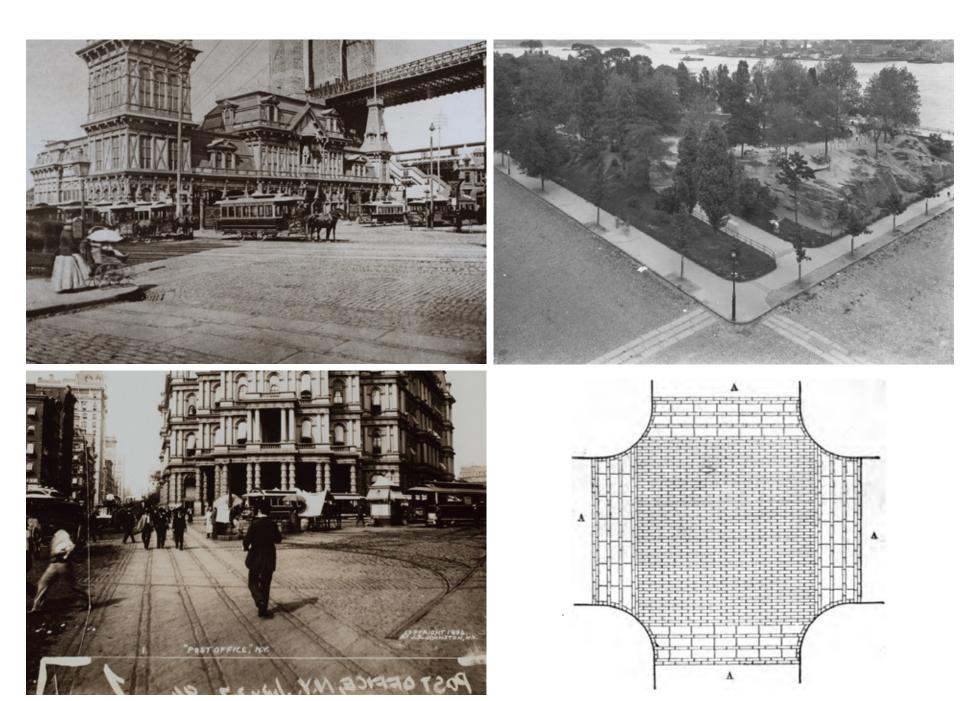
New York City's historic crosswalks (clockwise from top left): Water Street at Fulton Street, Brooklyn, in 1900; 86th Street overlooking the East River, Manhattan, in 1914; a typical 19th-century crosswalk treatment; Broadway at Park Row, Manhattan, in 1894.
